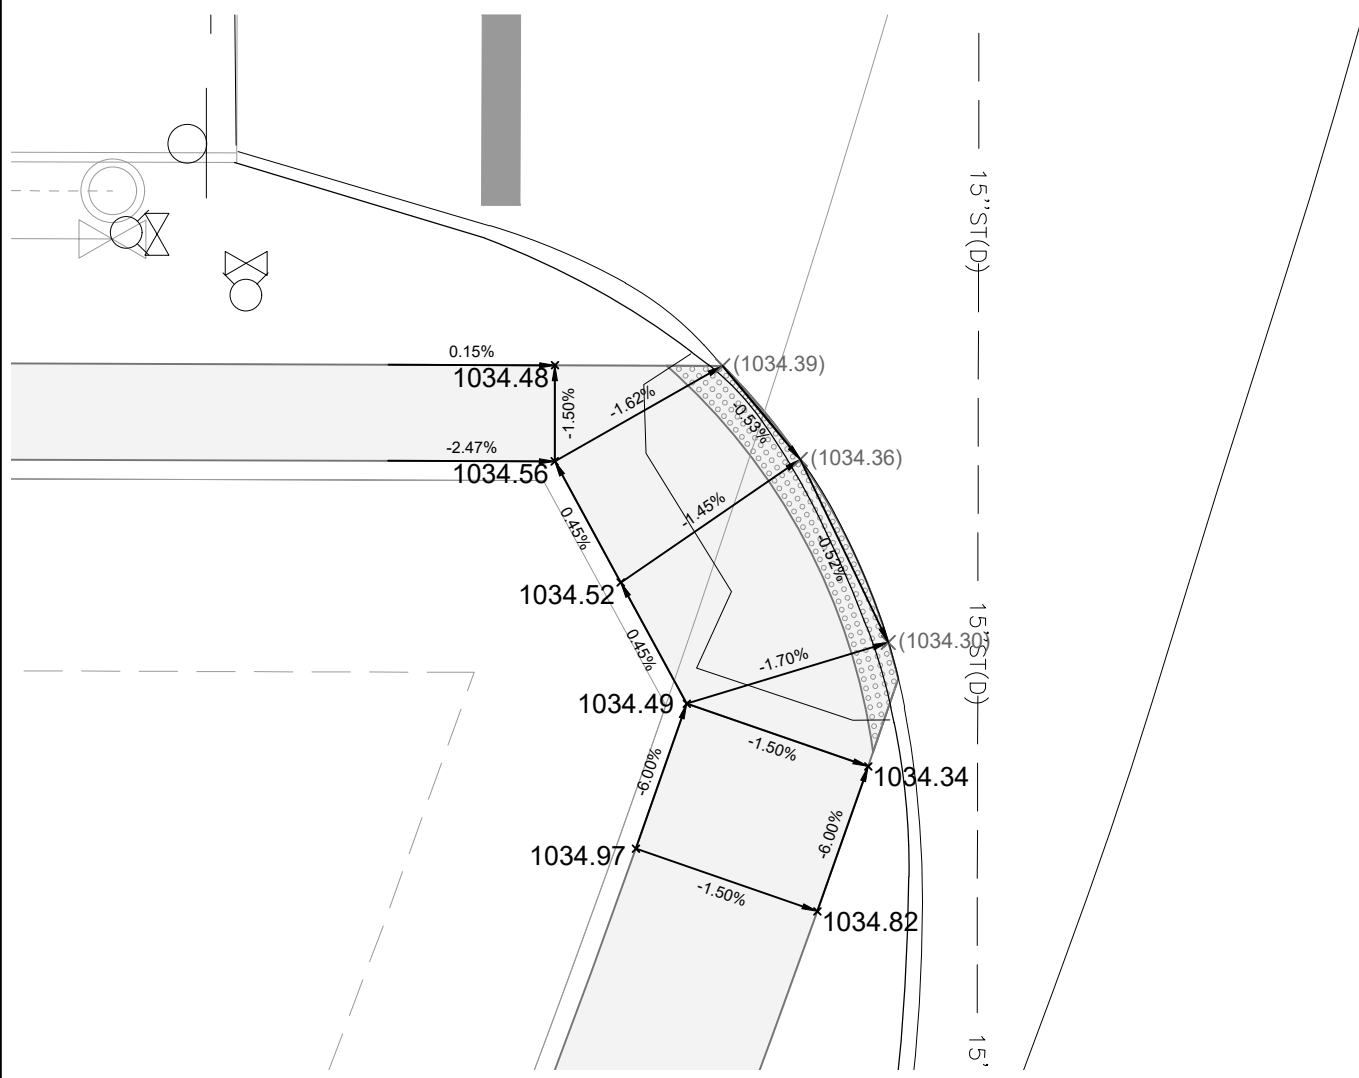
DETAIL K: INTERSECTION DETAIL (11TH ST AND DAISY LANE)
